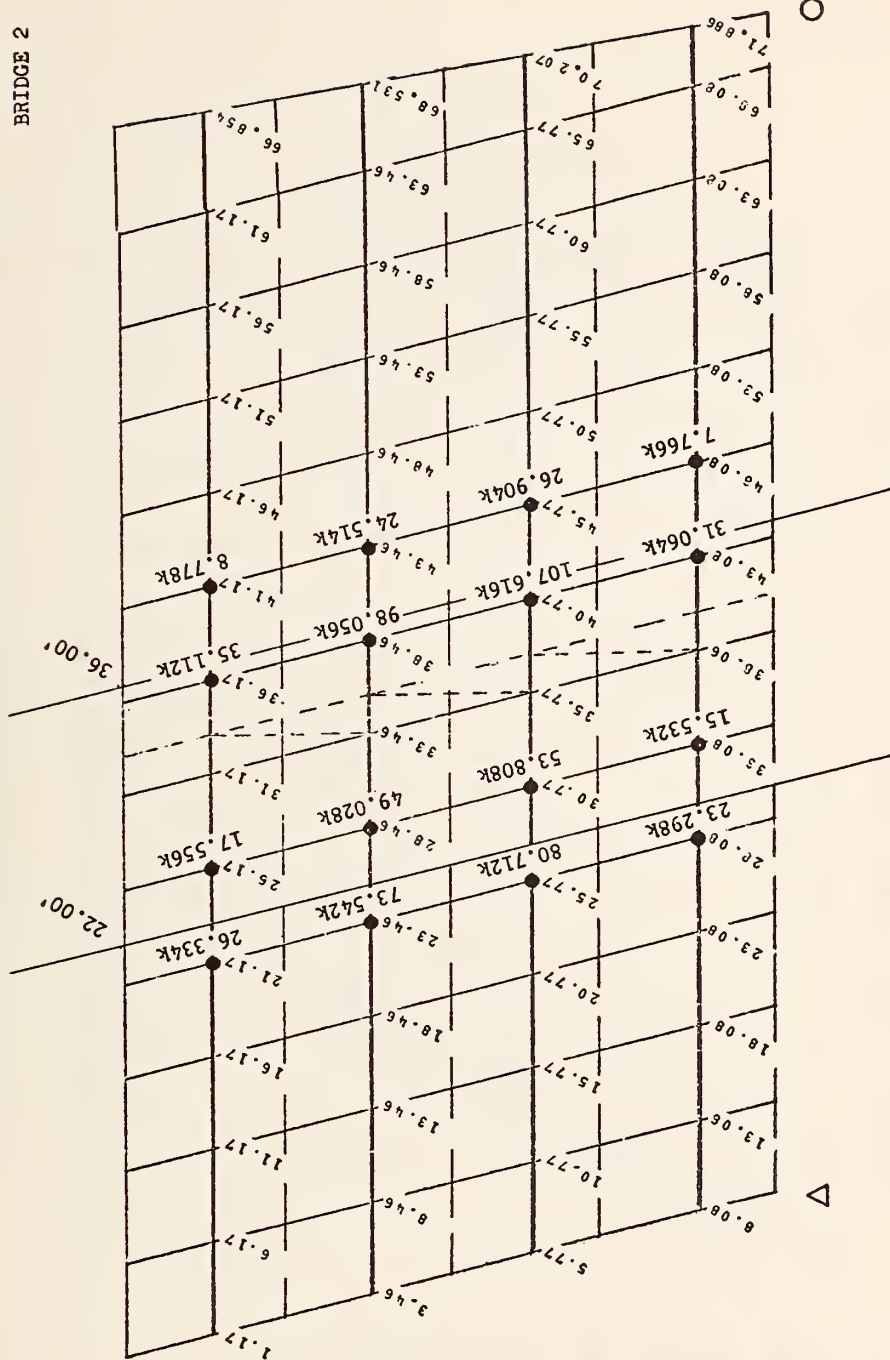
LOAD CONDITION 4, BRIDGE 2. STATIC LOADING
